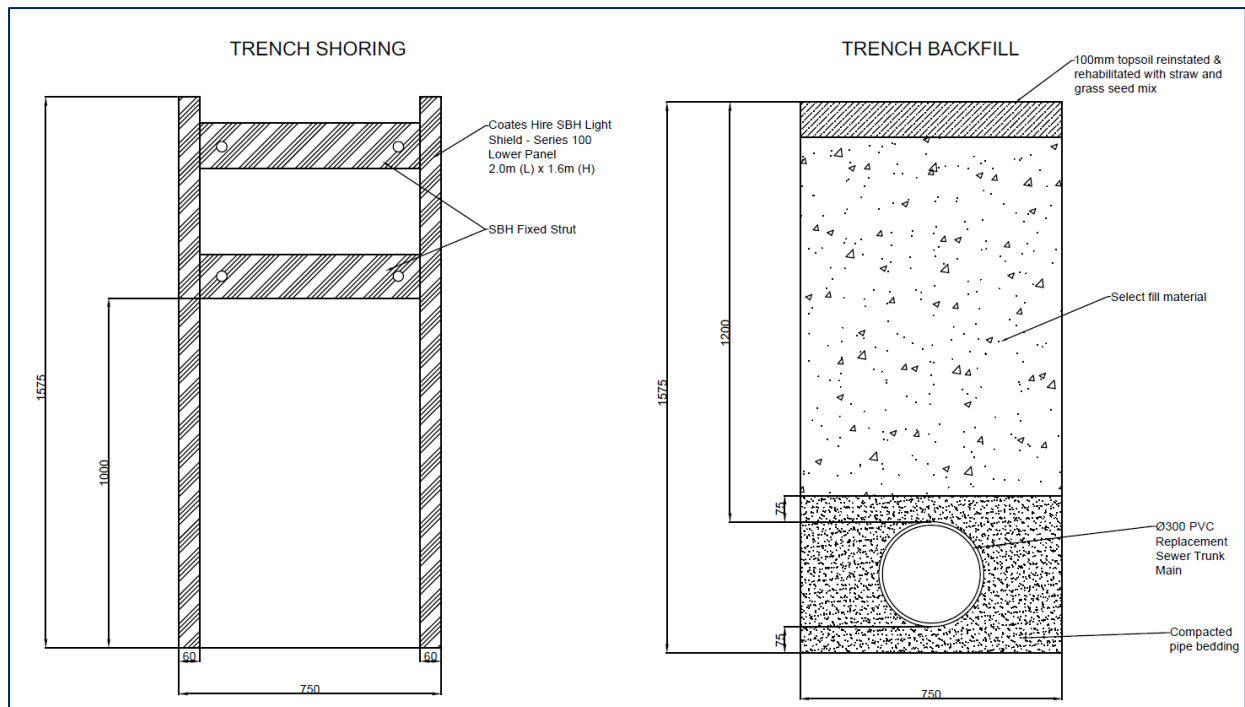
| Trench section detail for trench shoring and backfill (Source: from Applicant's documentation)
